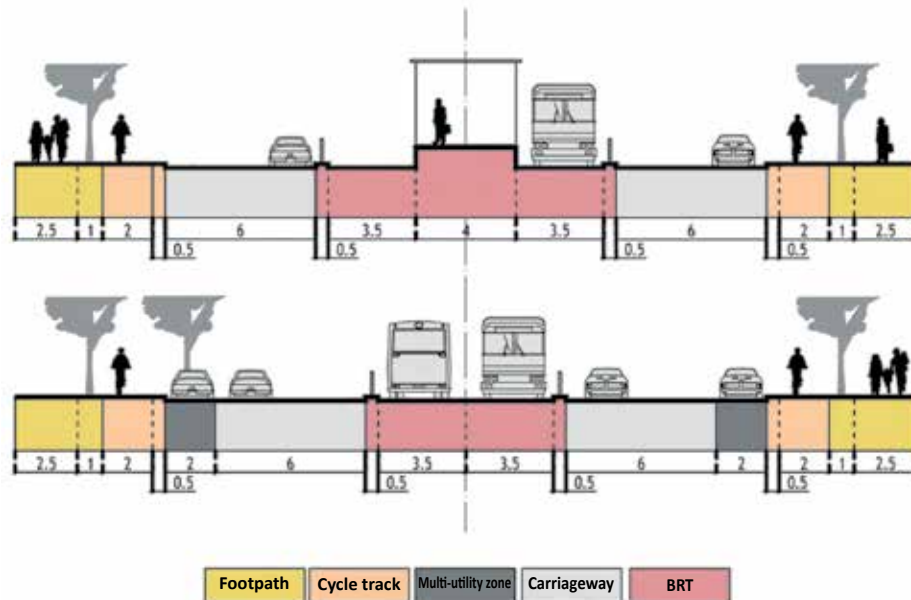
A typical BRT configuration on a street with 36 m ROW. The upper figure shows the cross section at a BRT station and the lower one shows the cross section at non-station location. (All dimensions in metres)
